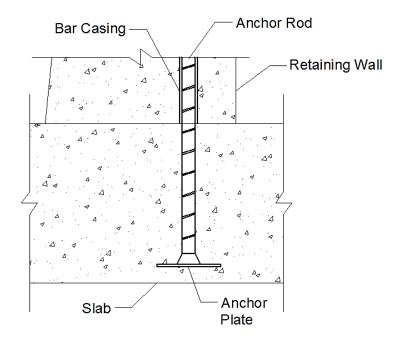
Anchor Rod Embedded in the Slab (Abernathy 2012)
